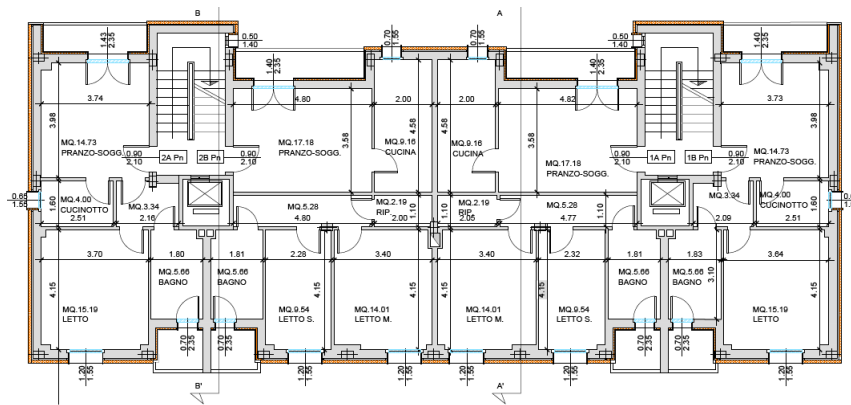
Typical Floor Plan of the Italian Case Study Building [389]
